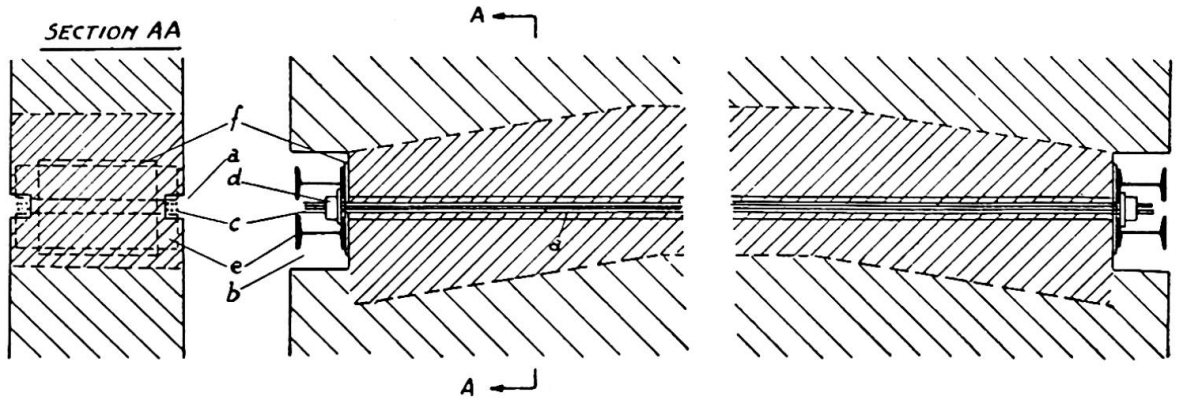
Diagram showing the formation of a prestressed beam in a wall.
